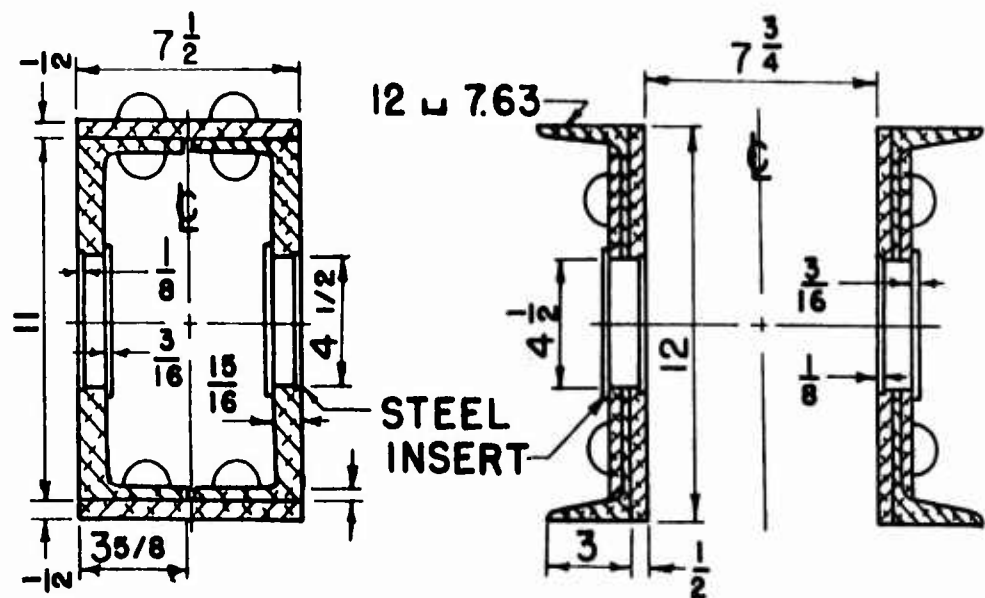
Layout and Dimensions of T-6 Aluminum Bridge
